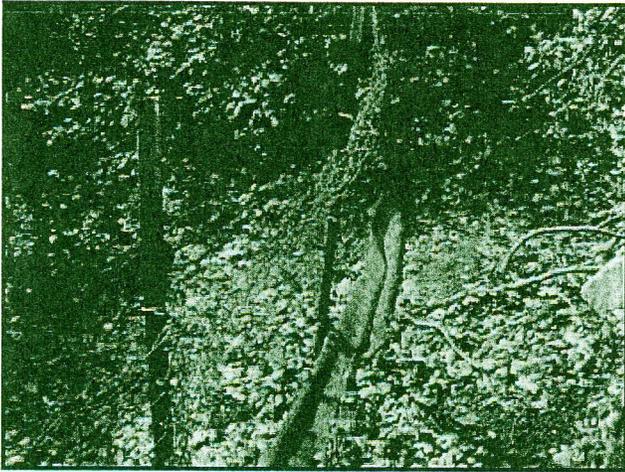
Debris barrier downgradient of the toe of waste dump #5
